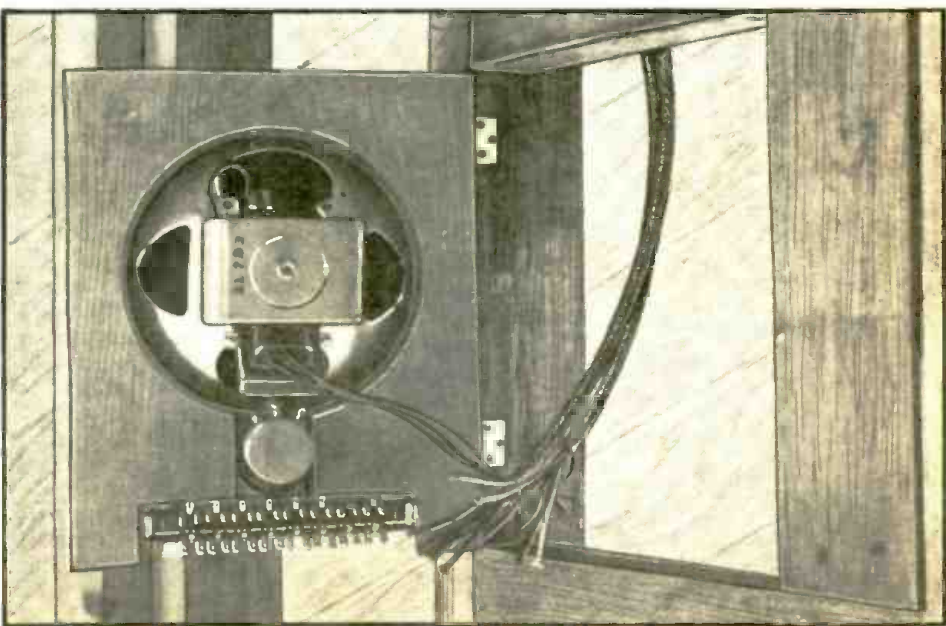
Fig. C. Ease and accessibility of servicing is the obvious keyword of this installation. Speaker, pushbutton switch and T-pad (the pilot light has not been mounted as yet) all mount on a single wooden bracket which swings on 2 hinges. When closed, the bracket is flush with the studs.
